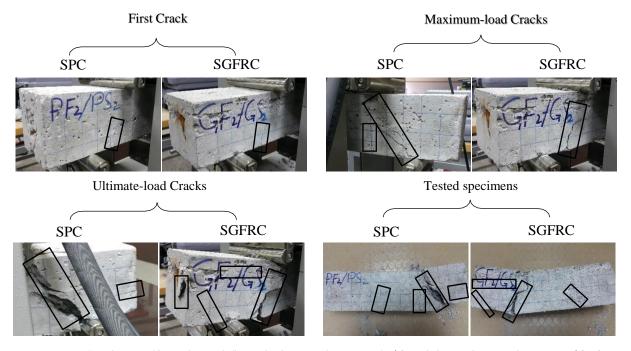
Behavior of beam-lets with flexural rebars reinforcement (3-Ø6) and shear rebars reinforcement (Ø6-76 mm)
